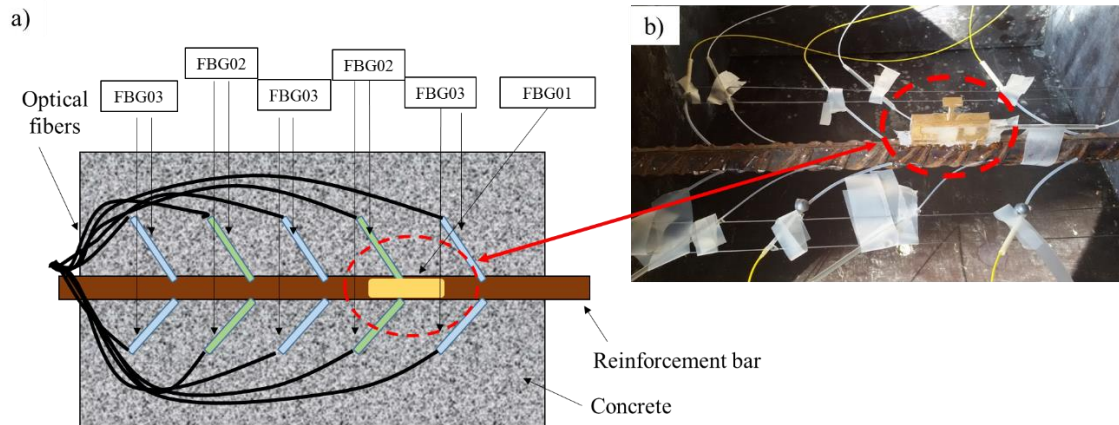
Disposition of the bond-slip FBG sensors inside the specimen.
